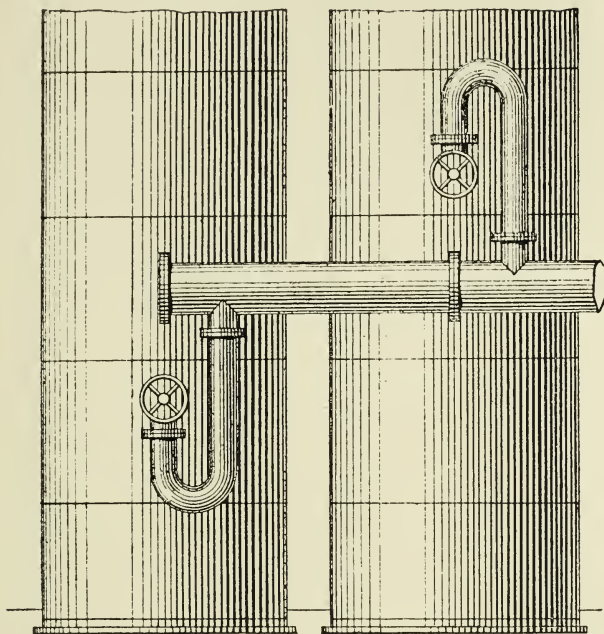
APPROVED METHOD OF CONNECTING STEAM PIPES WITH BOILERS.
